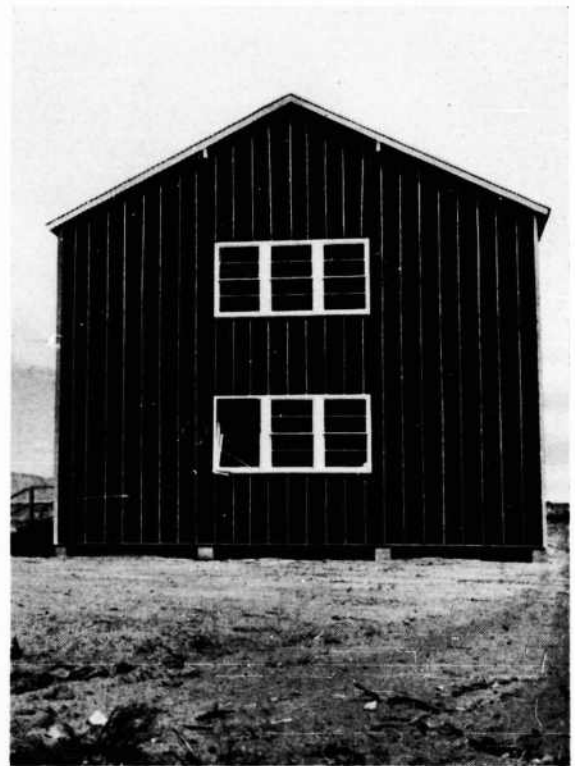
Barracks damage, Test 1. South elevation (away from blast).
